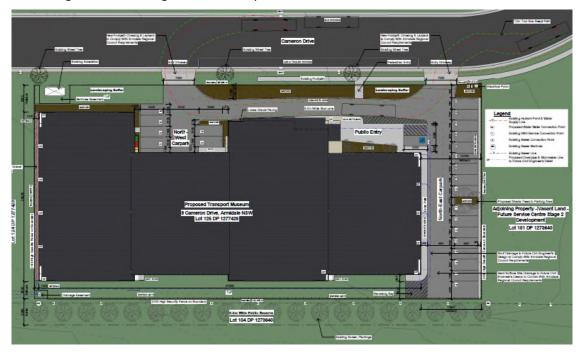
Proposed Site Plan showing off-street parking & bus drop-off lane
